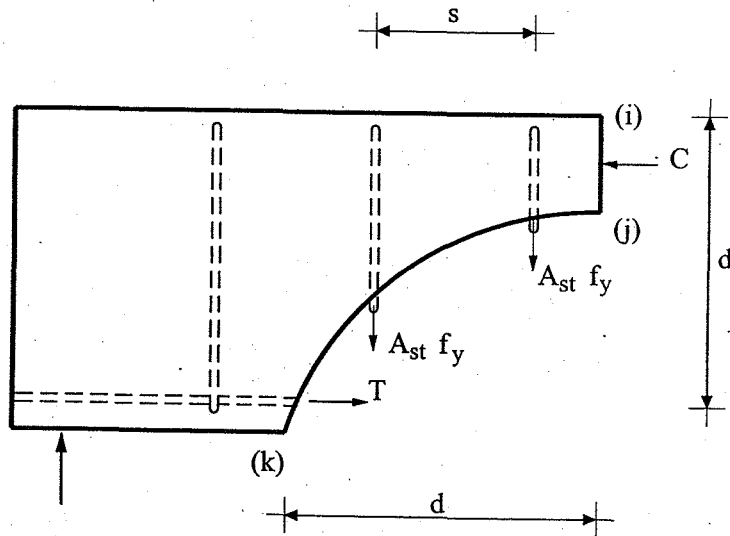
Internal forces in a cracked beam with stirrups
